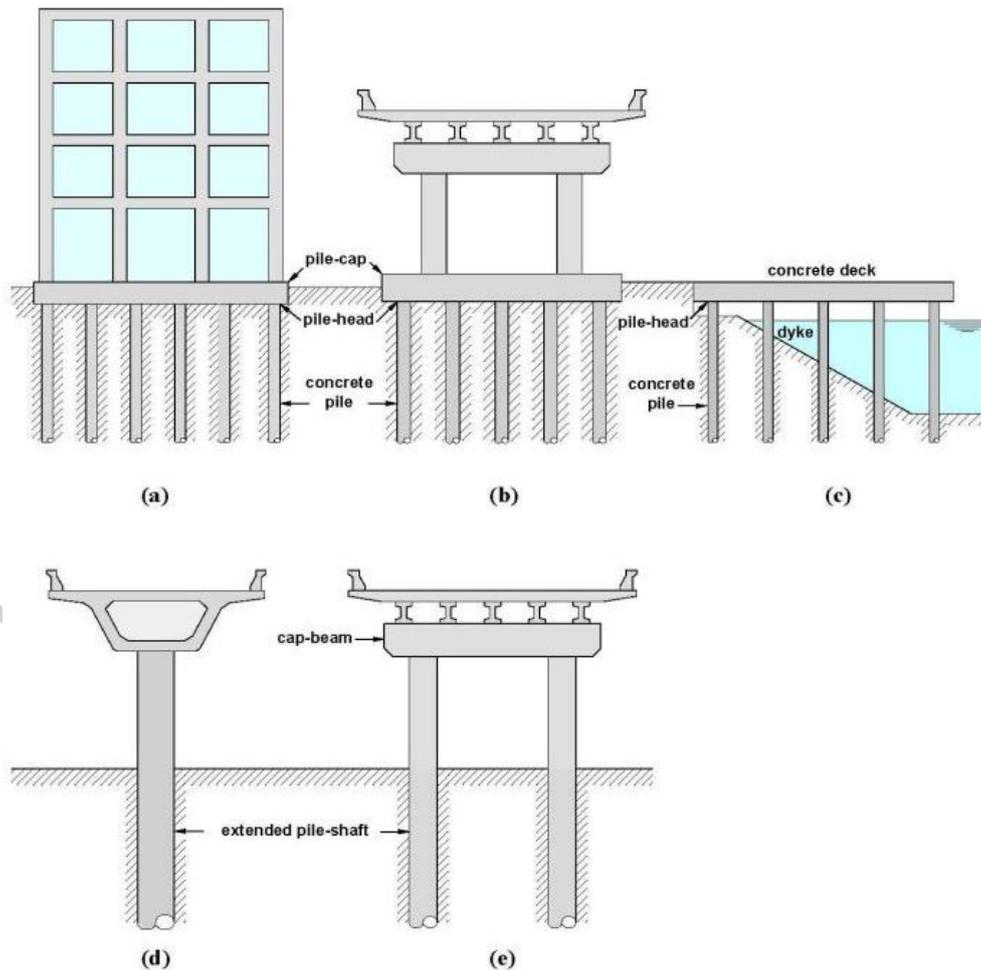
Various types of pile foundations: (a) group piles in a building foundation, (b) group piles in a bridge foundation, (c) group piles foundation in a wharf structure, (d) single-column bridge bent with extended pile-shaft, and (e) multi-column bridge bent with extended pile-shaft.
